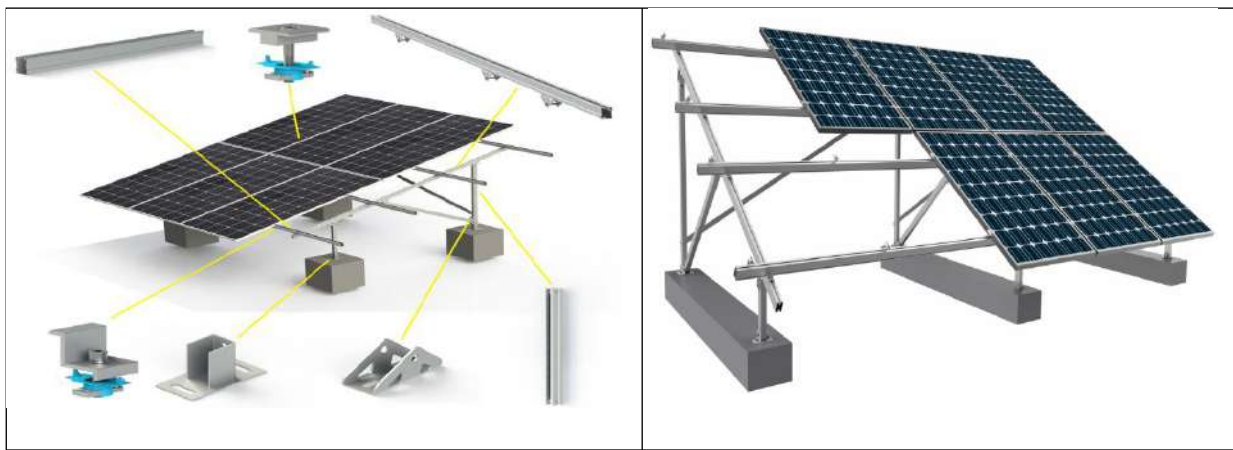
Proposed Rooftop & Ground PV Mounting Structure Model
